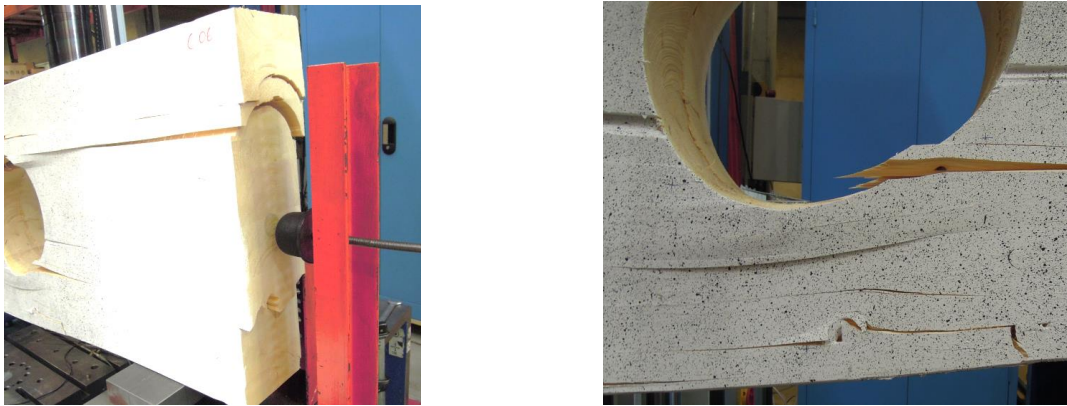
Tensile stress perpendicular to the grain and four shear failures (left); bending failure in the net cross section under the opening (right) of specimen C06
